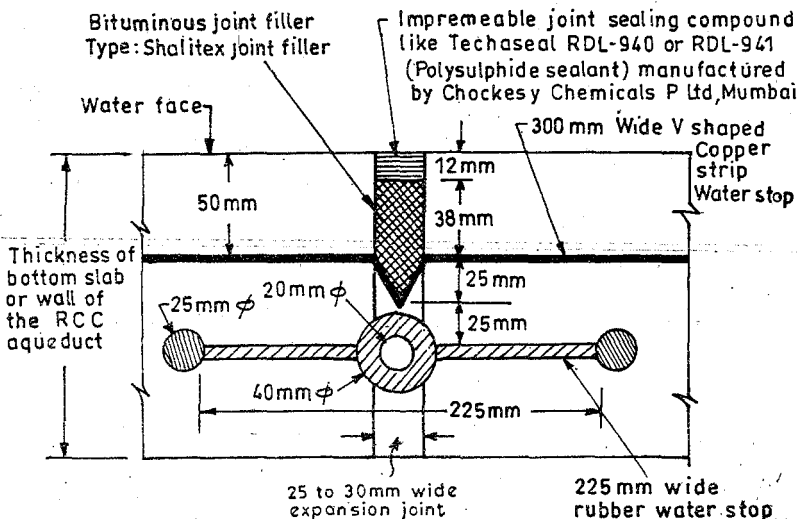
Details of typical Expansion joint in the base slab and walls of R.C.C. duct or trough.
